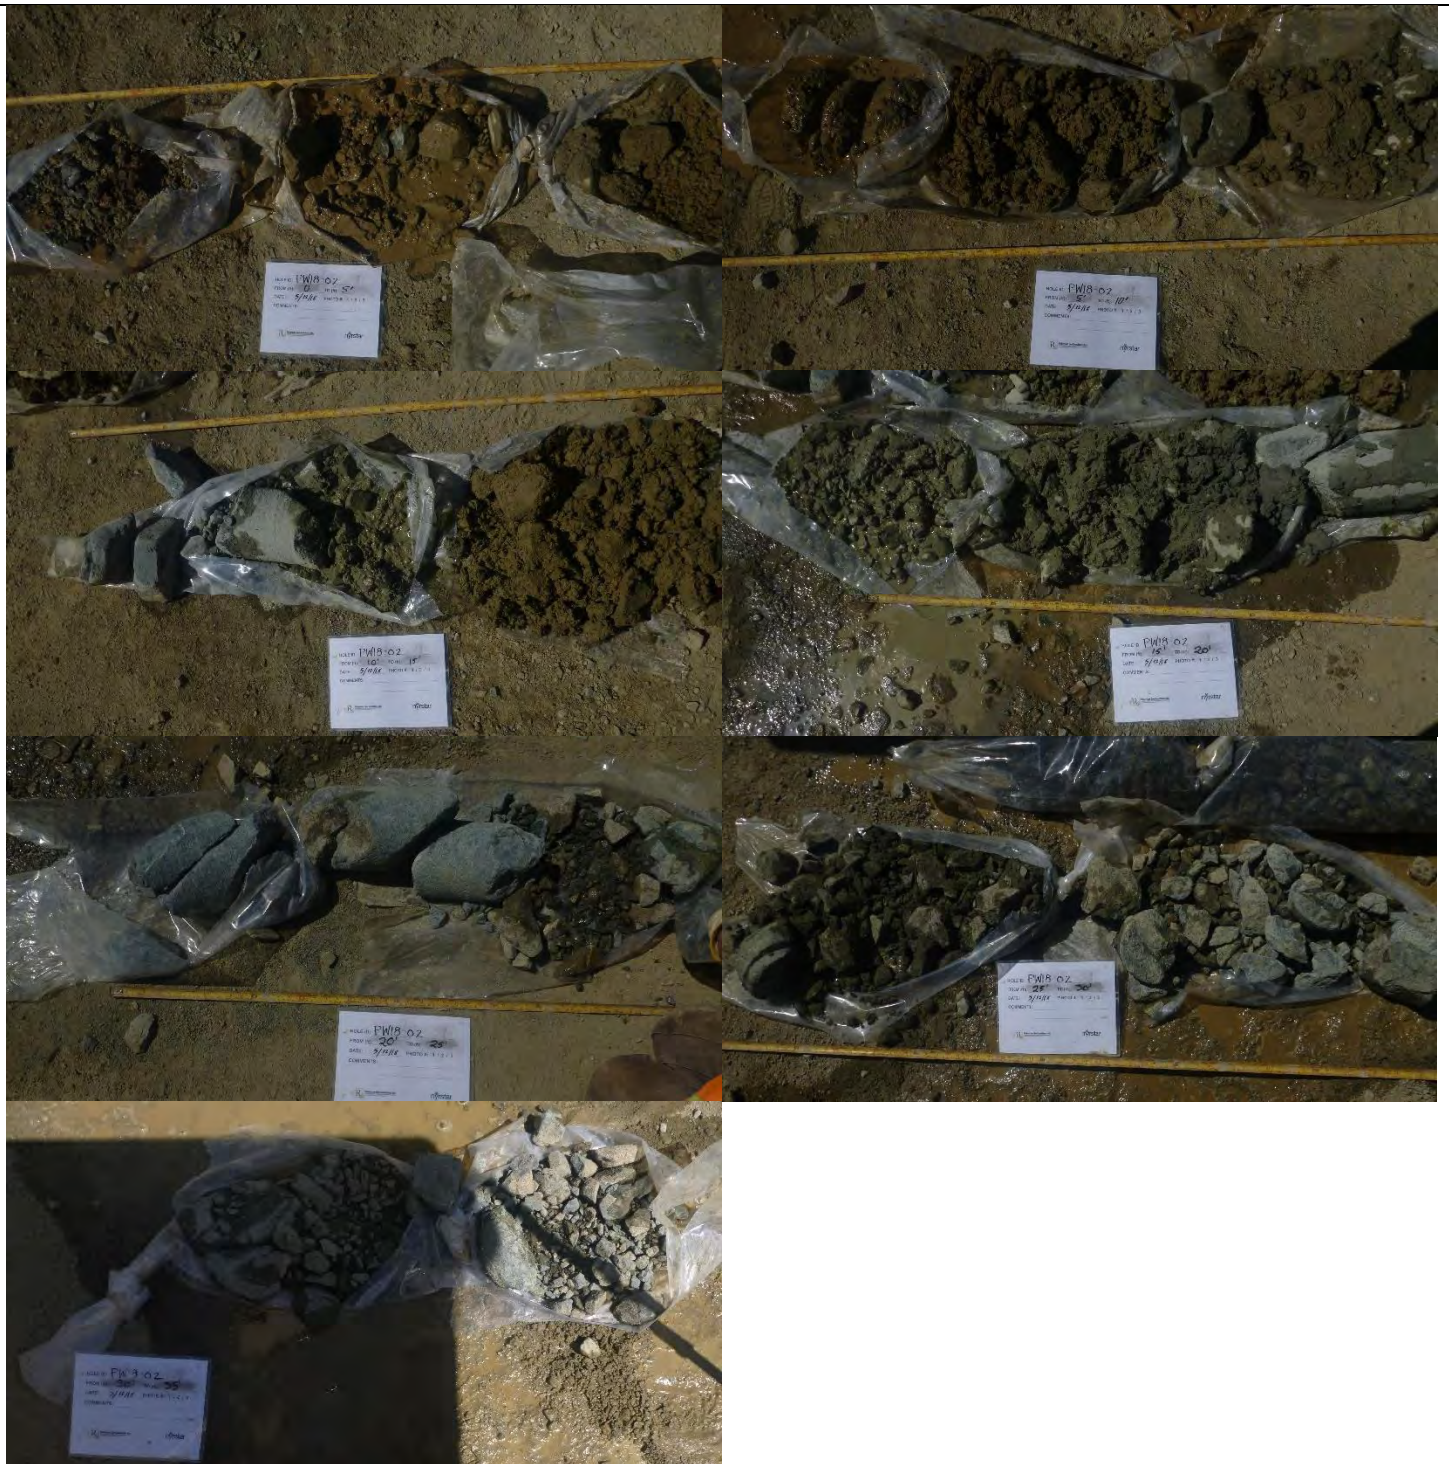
Soil cores at PW18-02 (from 0 to 37').
